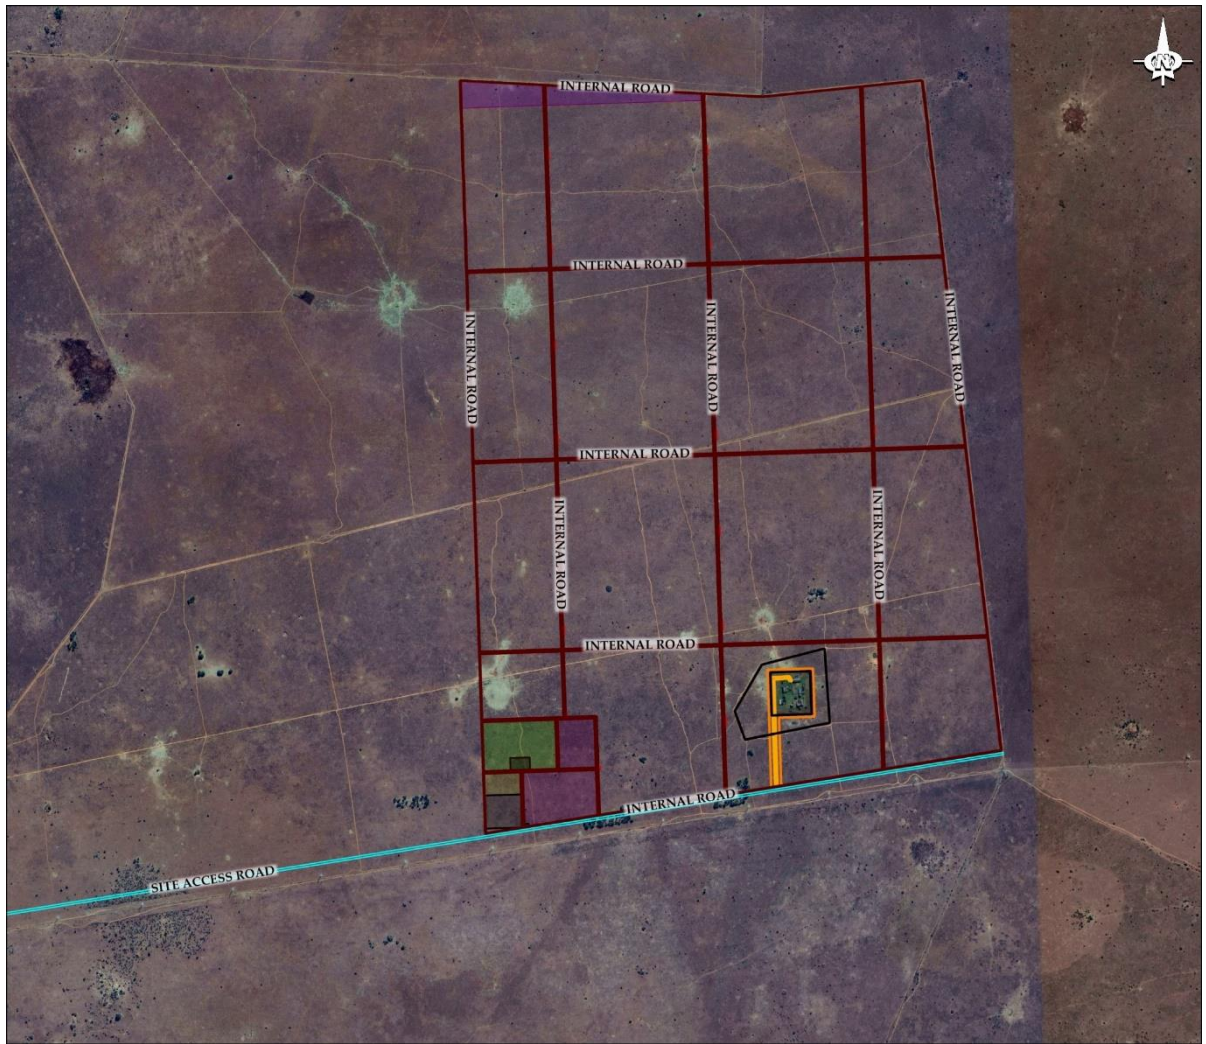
Conceptual layout of Jersey PV SPP showing proposed internal road network
